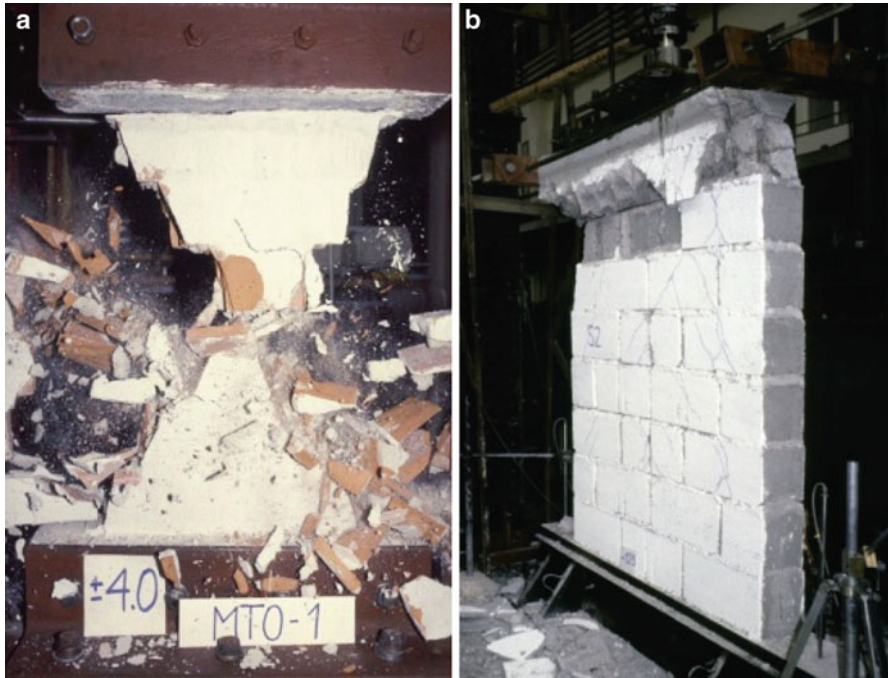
Brittle shear failure of a highly stressed unreinforced masonry wall (a) and (b) brittle failure of a complete course of concrete hollow blocks which prevented the activation of reinforcement
